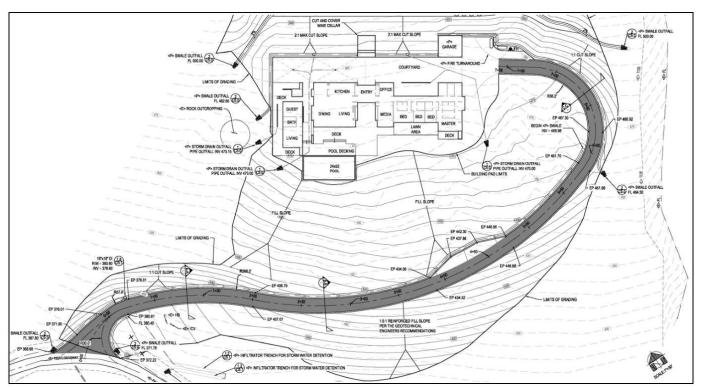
Overview of project features from the site plan (Source: Project civil engineer).
